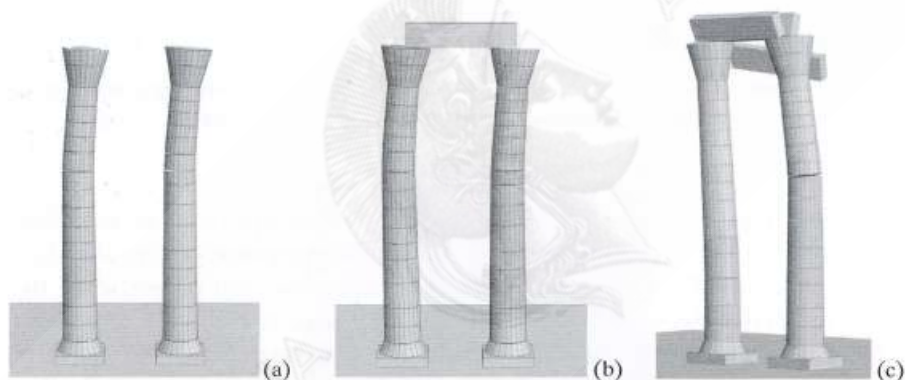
Earthquake response of multidrum columns: (a) free-standing columns with joint opening at many places; (b) two columns connected with architrave with joint opening at many places; (c) two columns connected with architrave with joint opening at few places (Psycharis 2005).
